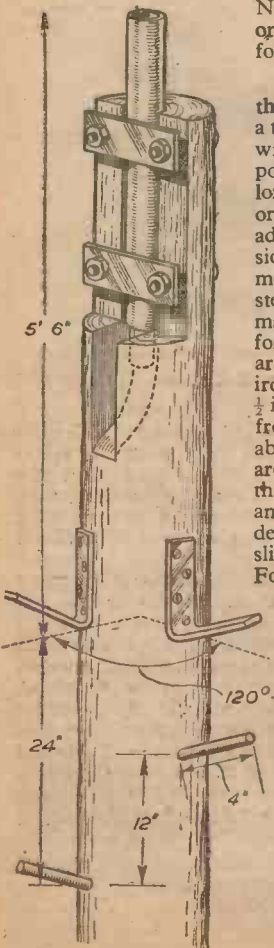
Side view and section of the pole, showing method of attaching the wind-charger.
